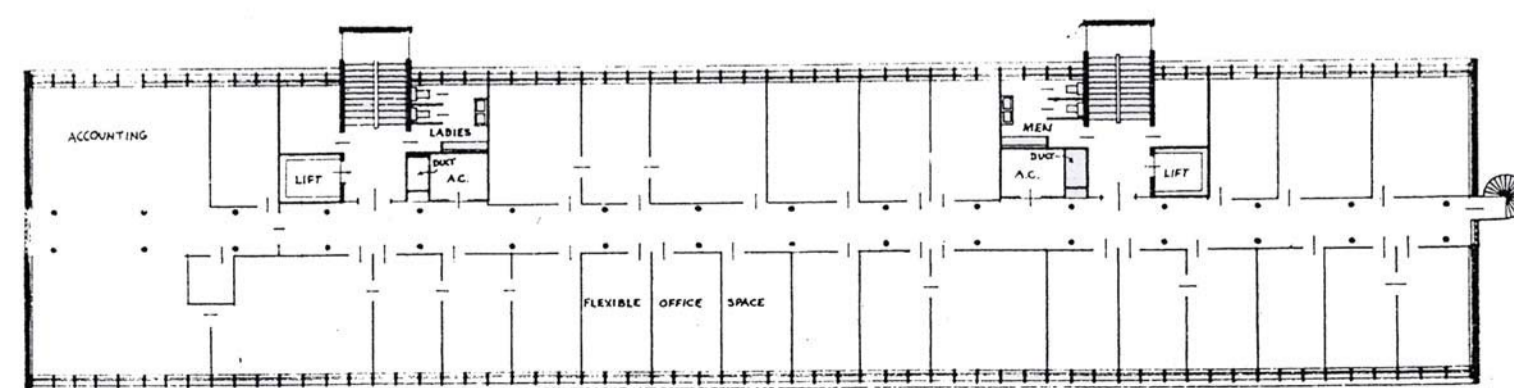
Original office floor plan by Stauch (Stauch 1951:4)
